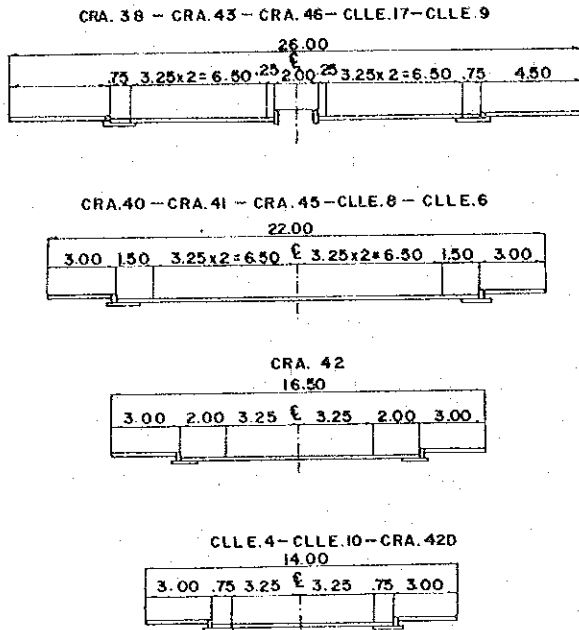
TYPICAL CROSS SECTION OF PLANNING STREET
